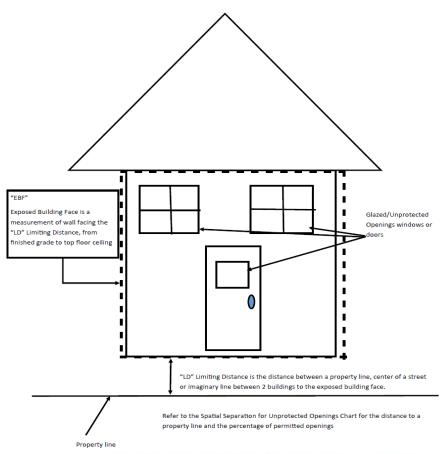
NOTE THAT A TYPICAL BLC WILL HAVE MORE DETAIL
